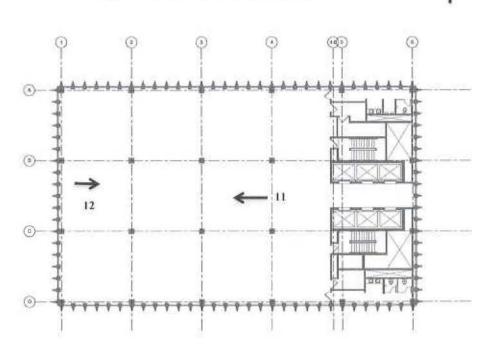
Photo Key, Eighth Floor, Typical Floors 3-19
